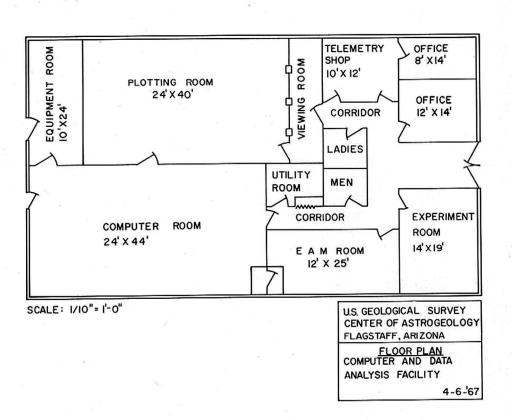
Floor plan of the planned interior of the Apollo Data Facility (ADF) that was built for the Branch of Astrogeology by the Flagstaff construction firm of Buttrum and Jamison (in January 1967) at 2720 N. Fourth Street in East Flagstaff, Arizona. This facility, conceived and developed by the USGS, Branch of Surface Planetary Exploration in Flagstaff, Arizona, was a working precursor to the Science Support Room-concept at the Manned Spacecraft Center, Mission Control Building, in Houston during the Apollo missions); USGS photo P475, F1167321 (see Fig. 44).
